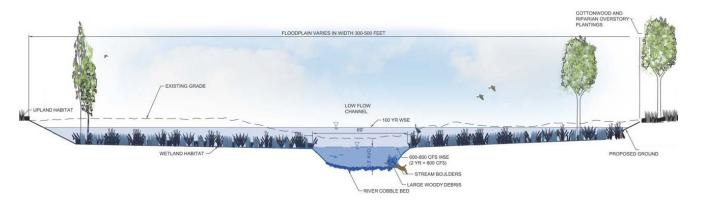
Alternative 1 Cross Section [River Restoration, Inc. 2015]
